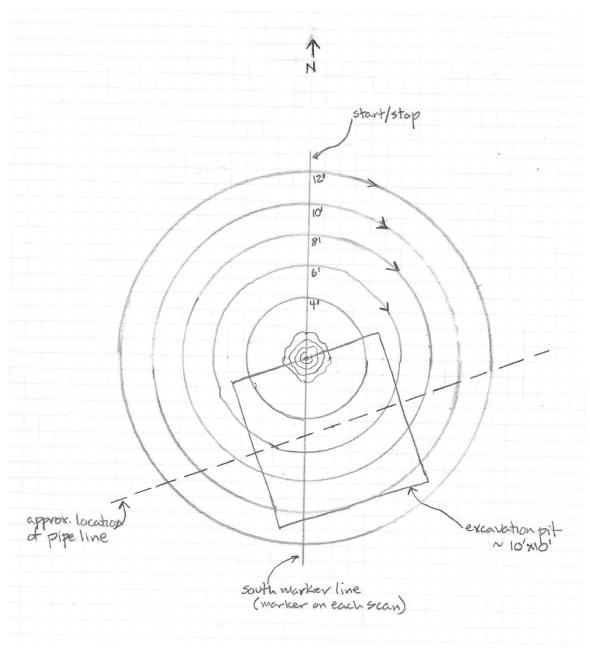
Sketch of stump, scan lines, excavation pit and approximate pipe location from potholing.
